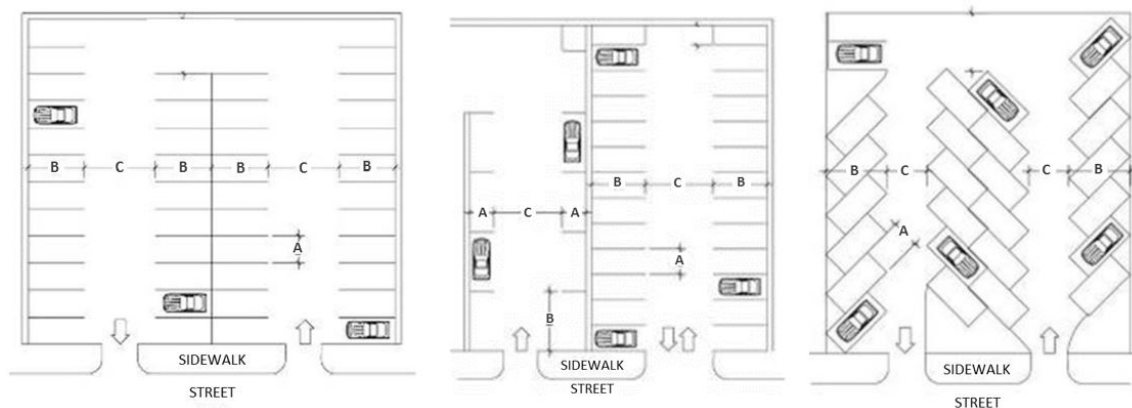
Parking Space and Drive Aisle Dimensions
